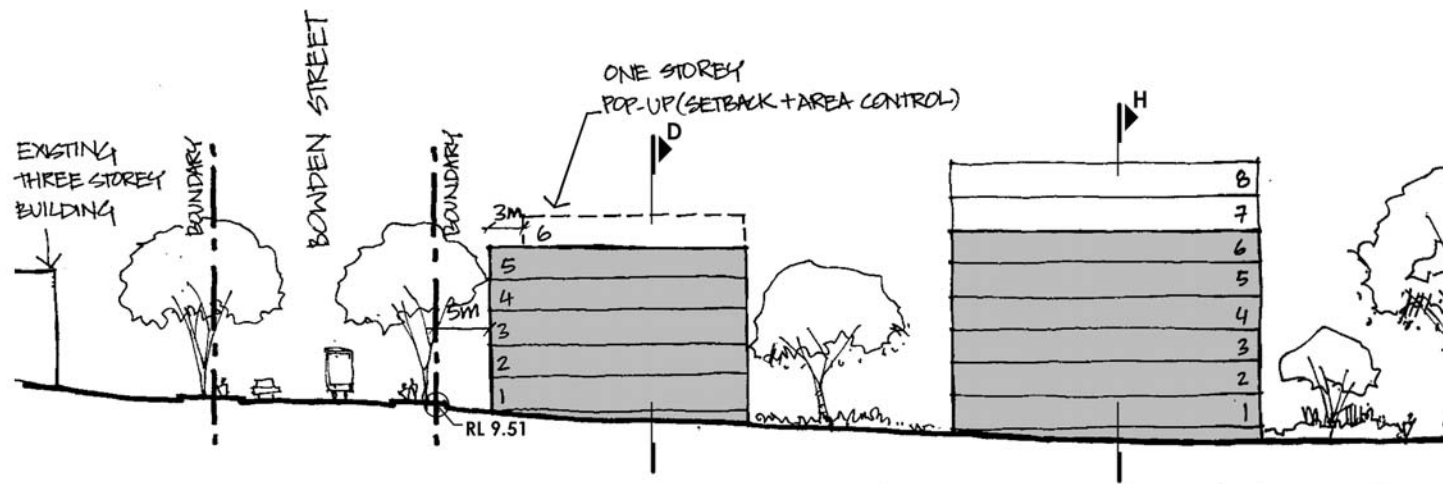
EXAMPLE STREET WALL ELEVATION AND SECTIONS ILLUSTRATING BUILDING HEIGHTS AND SETBACKS AT STREET FRONTAGE, NANCARROW AVENUE NORTH
